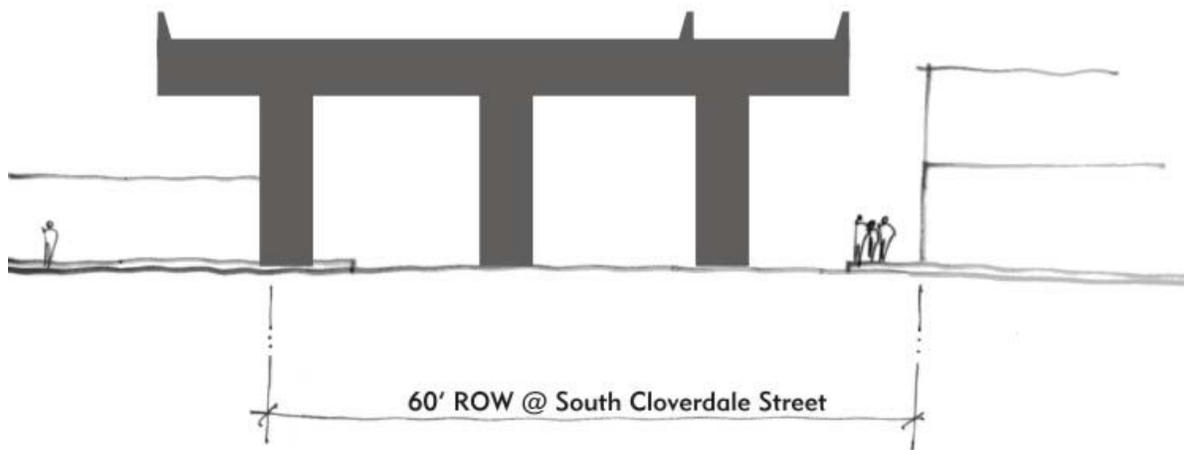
High-Level Fixed-Span Alternative Bridge at S. Cloverdale Street and S. Sullivan Street
